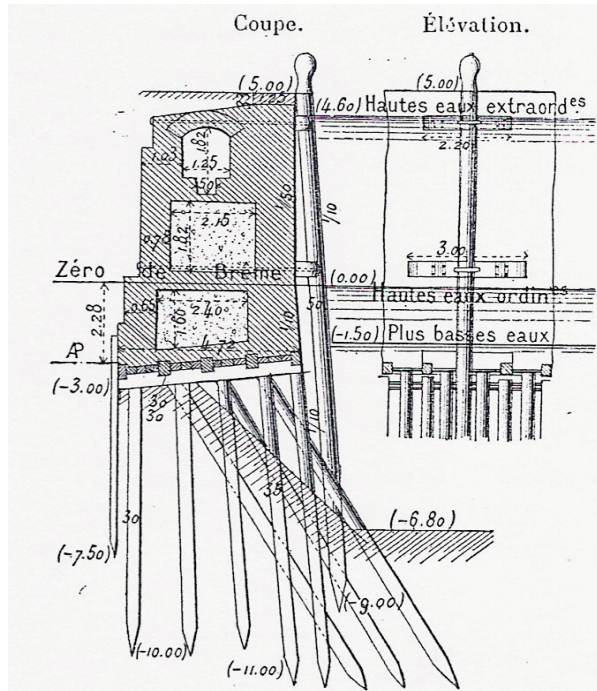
Cross-section of Quay wall Bremen 1840 [Rochemont et Desprez 1900]
